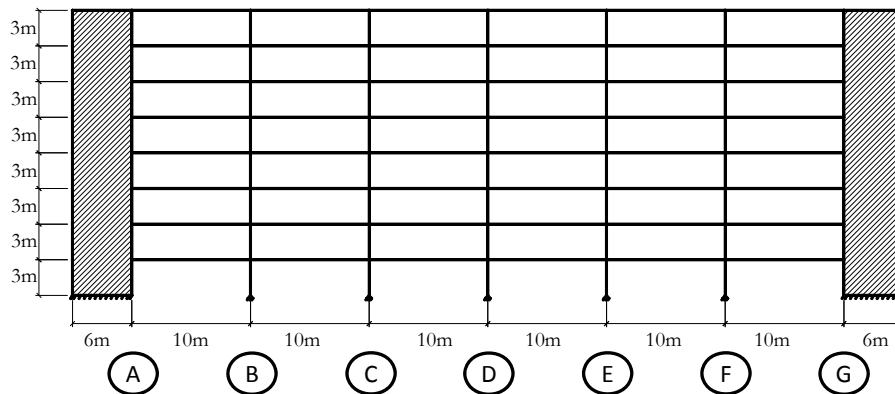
Geometry of sub-structure III, car park building alignment 2
